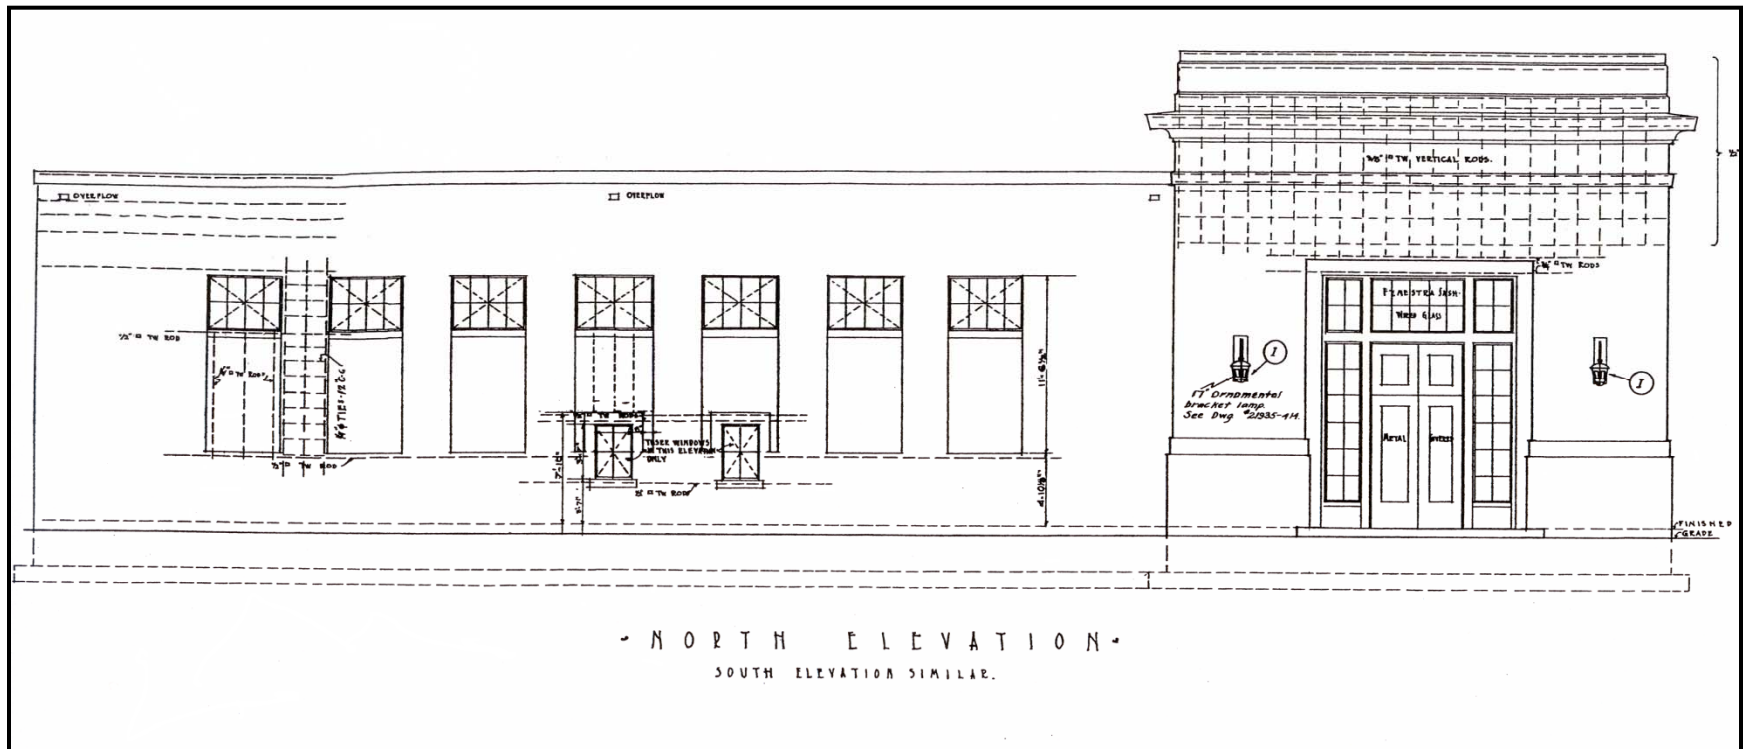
Architectural Diagram of North Elevation of Southern California Edison (San Diego Gas & Electric) Building, ca. 1917.
